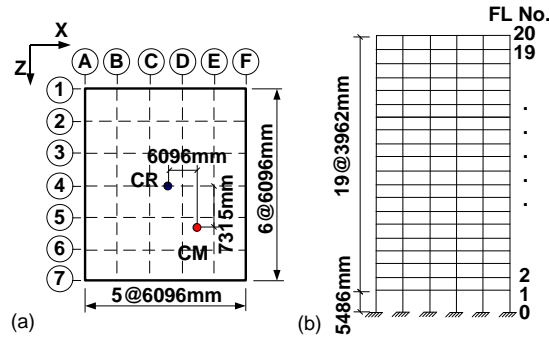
(a) The typical floor plan and (b) elevation of ASY20.
